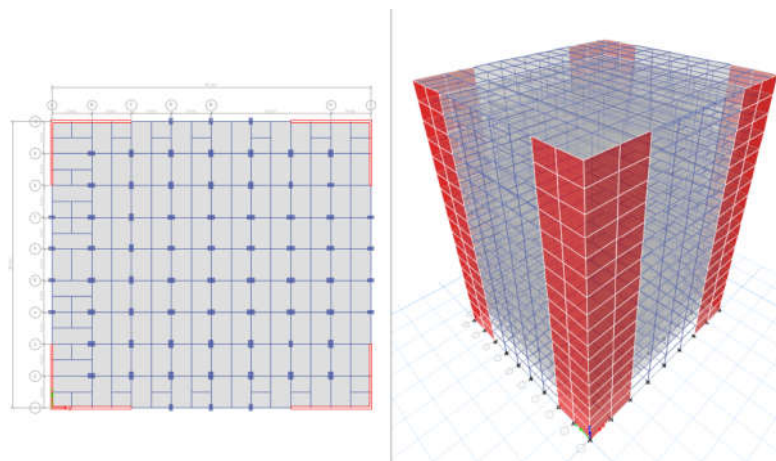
Plan and 3D View of G+15 Corner Placed Shear Walls Structure Modelled in Etabs
